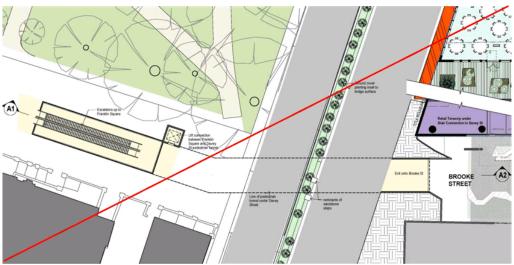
proposed tunnel link between Franklin Square and Brooke Street – early stage concept sketch - not part of this planning application
